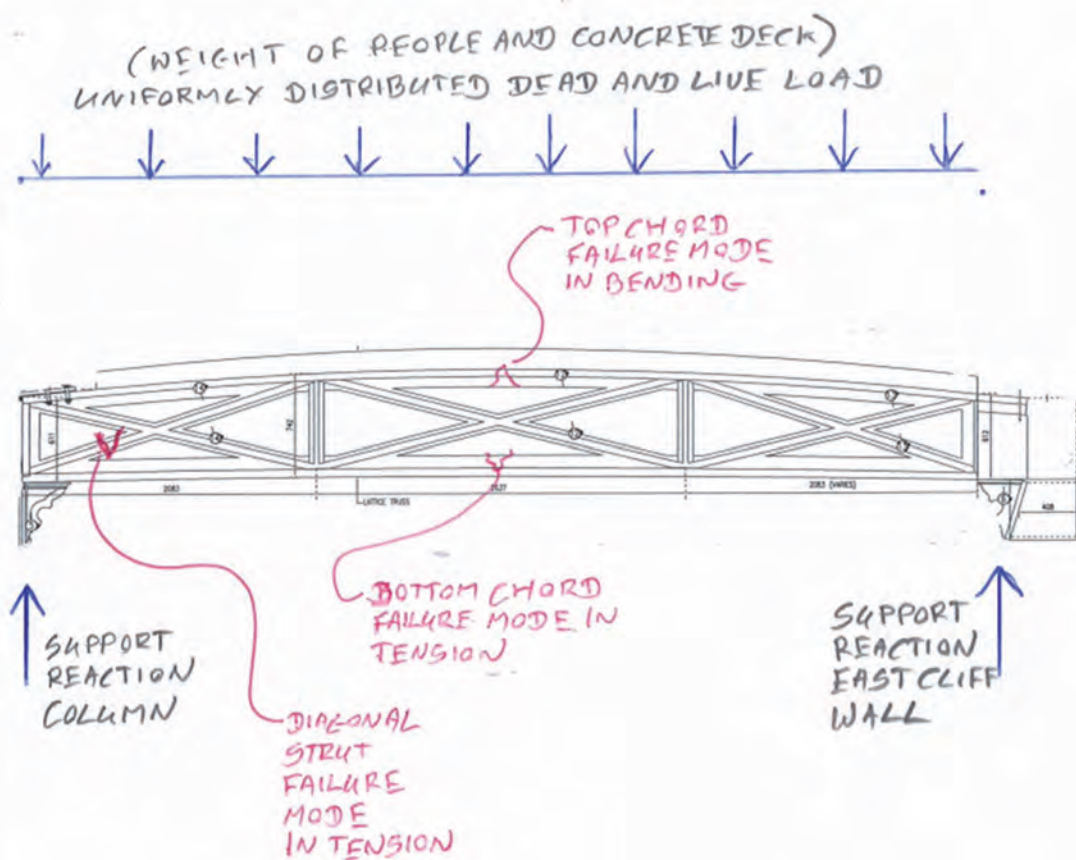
Indicating principal failure modes of consideration with the Diagonal Strut mode identified as governing overall truss capacity.
